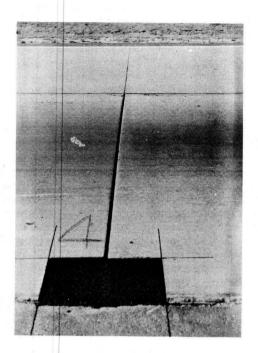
Intermediate sawed joints on Rt. 15 in Union. Note comparative widths of sawed joint #4 across the pavement. Joints were sawed originally full width of pavement.
